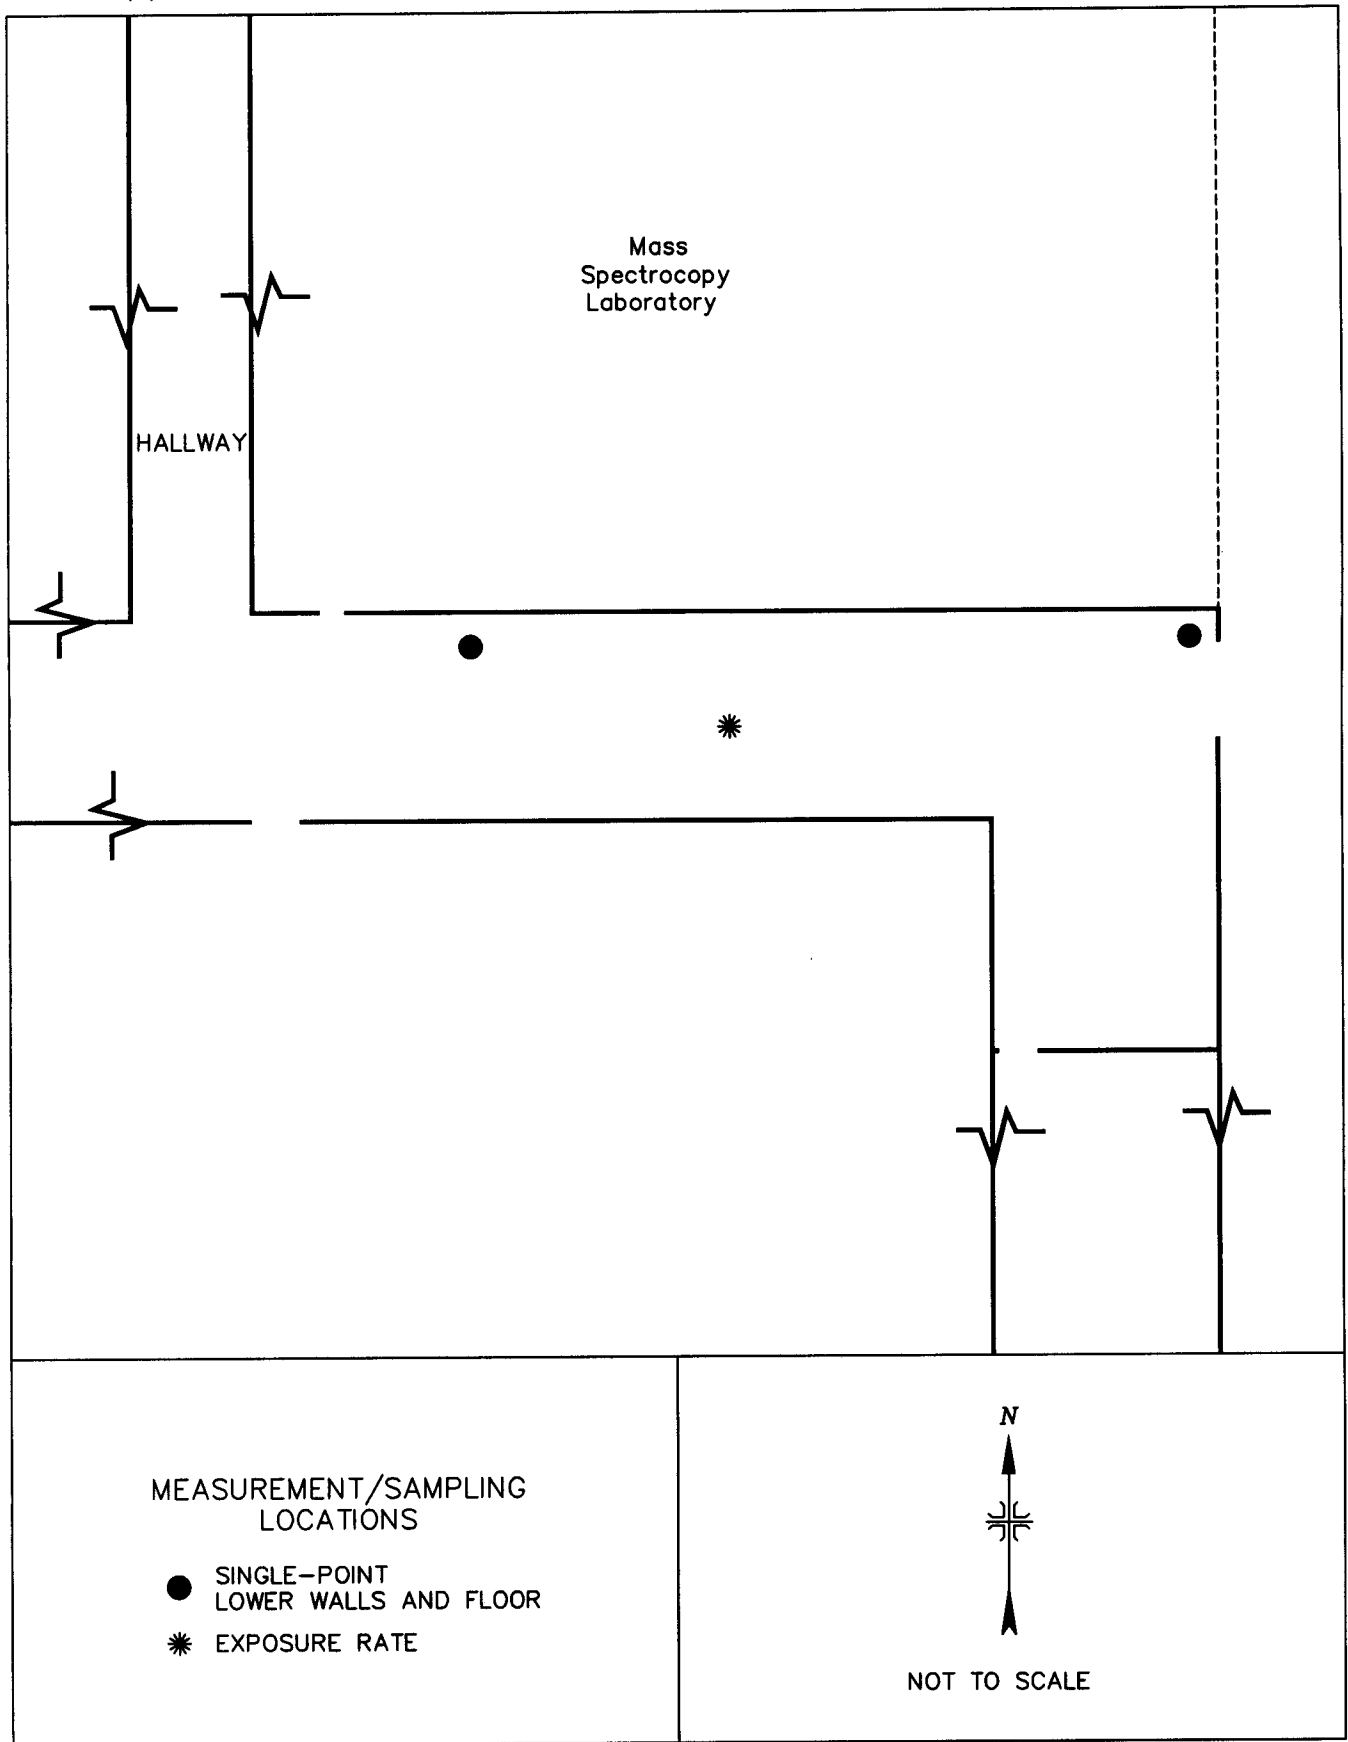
Building 104, South Hallway – Measurement and Sampling Locations
